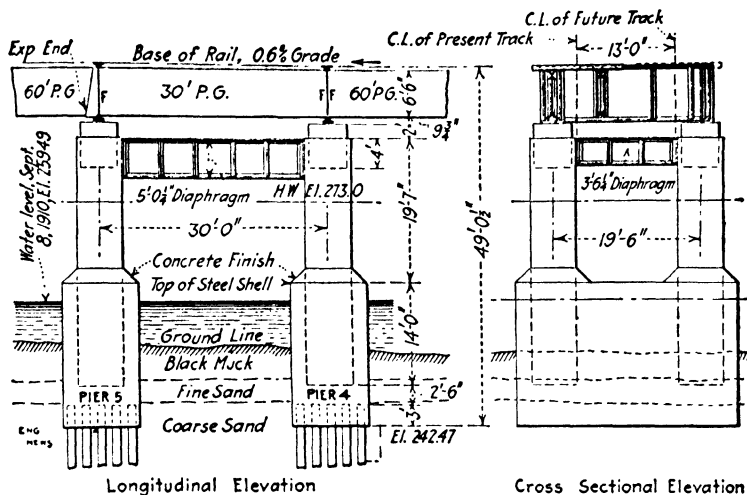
STEEL TUBULAR PIERS, OXFORD MILL POND BRIDGE, CHICAGO & NORTHWESTERN RAILWAY.
